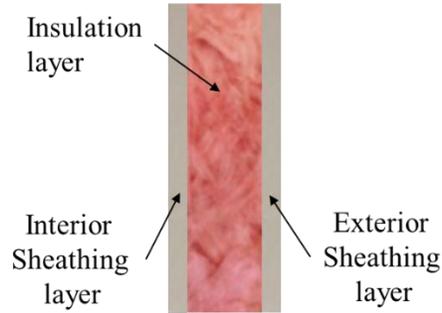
Insulation system: a layer of insulation, interior and exterior sheathing layers.
